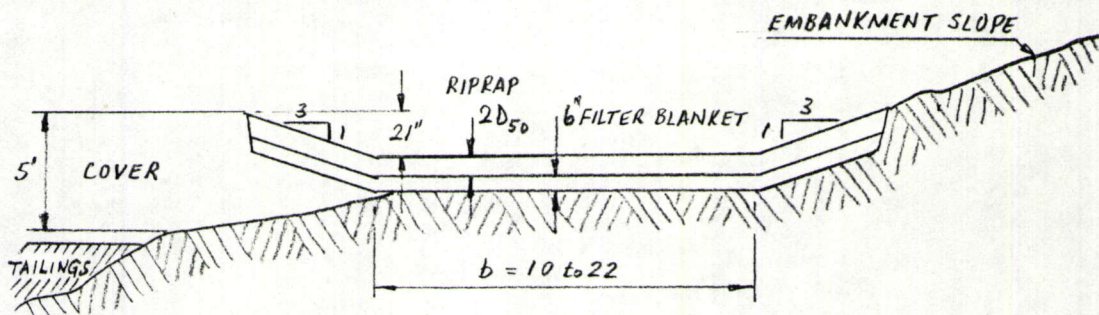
TYPICAL CROSS SECTION OF SECONDARY DIVERSION
